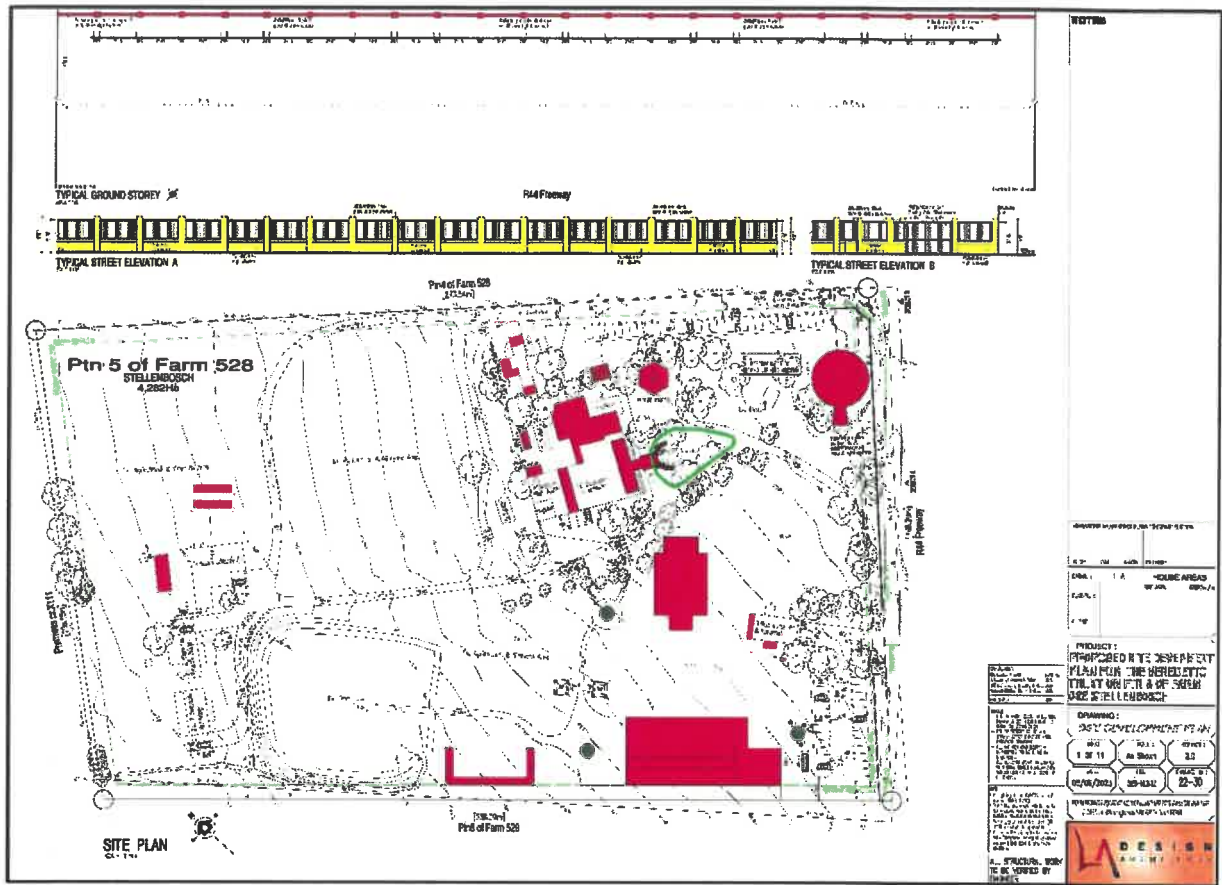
Updated site development plan for Ptn 5 of Farm 528
